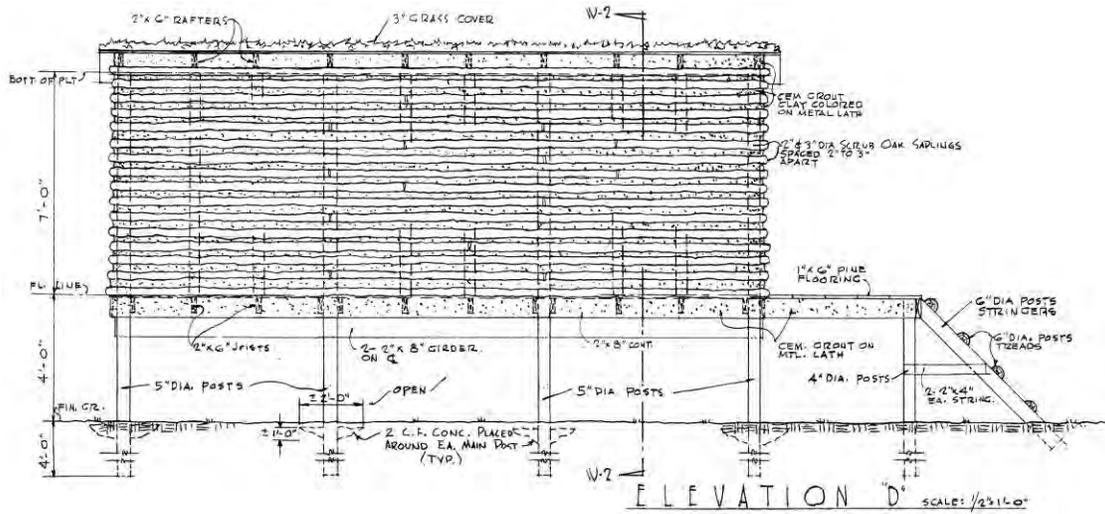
Montagnard house elevation "D", Camp Gordon, 1966 (standard drawing GOR 28-13-09 sheet 16, Vietnamese and Montagnard houses plans, elevations, and sections, 1 April 1966).
